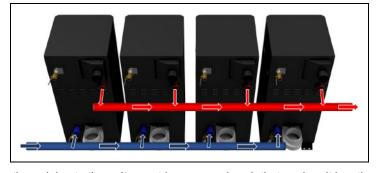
Valiant-FT Reverse-Return Piping Configuration (flow illustration)
